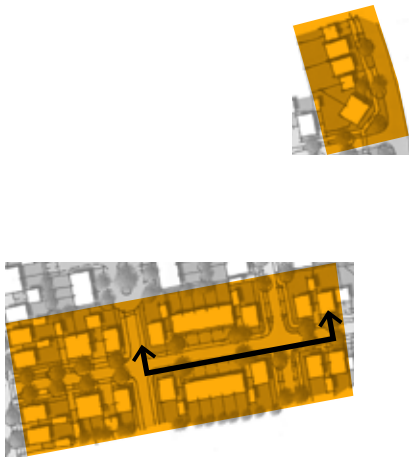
'WARM' ELEVATION LOCATION PLAN
